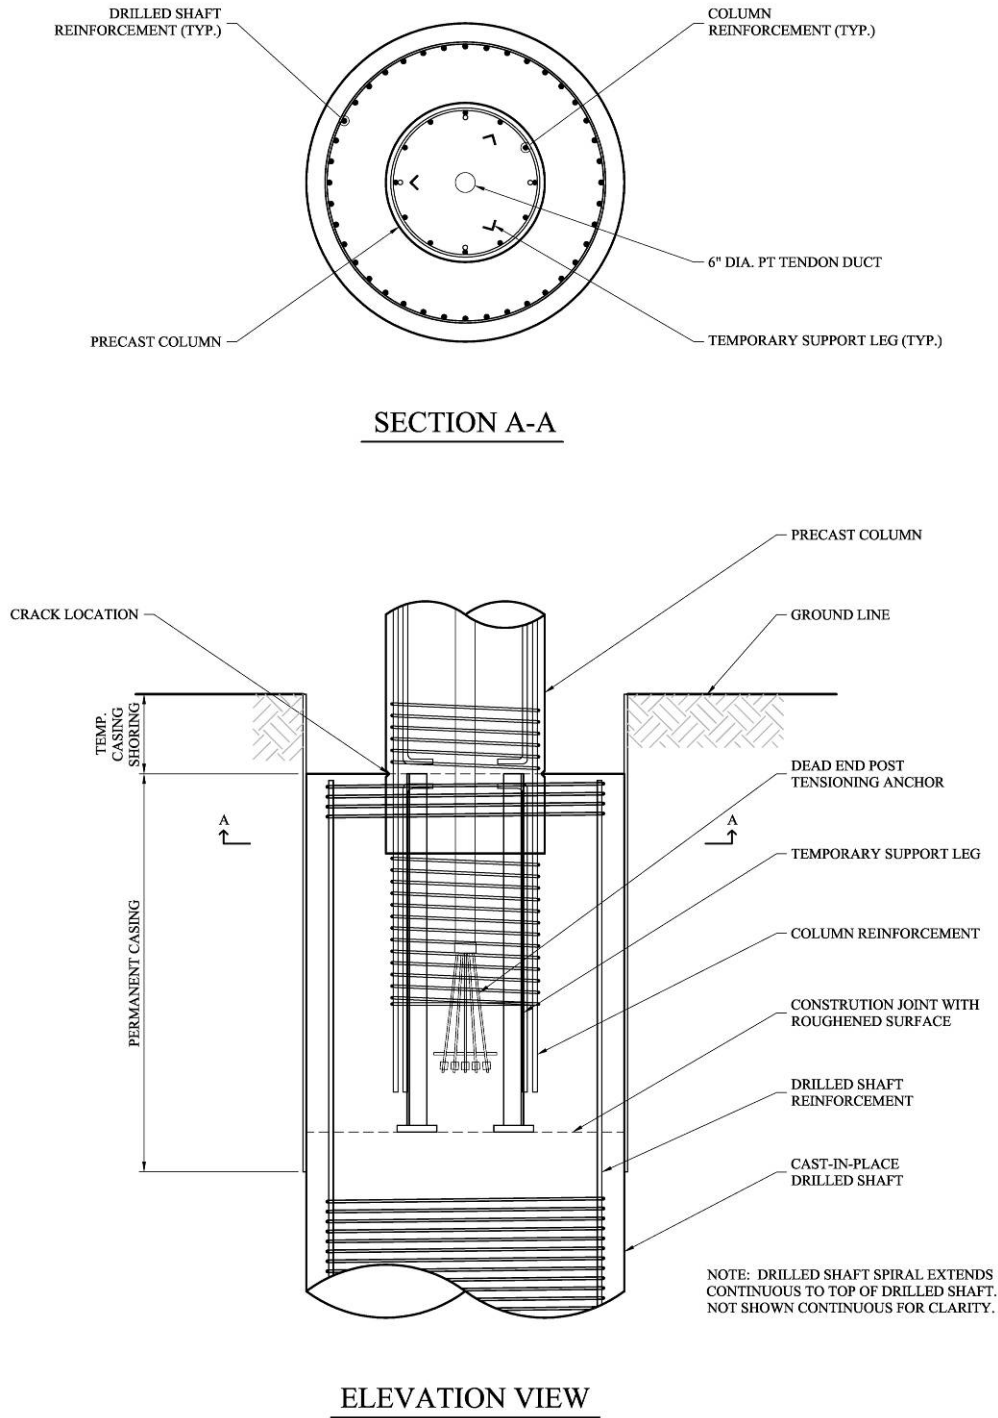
Proposed Footing-to-Column Connection for Hybrid Frames
